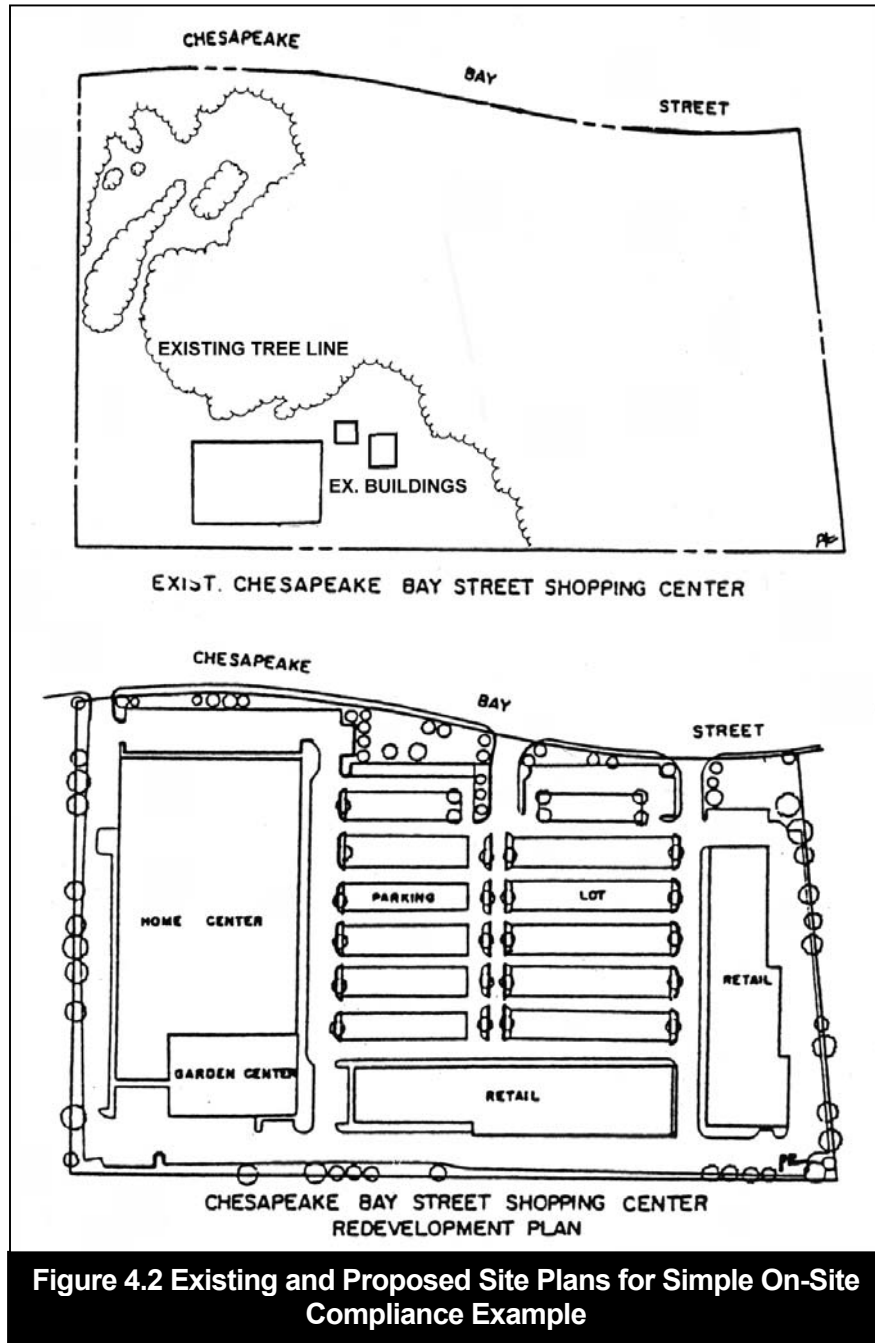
Existing and Proposed Site Plans for Simple On-Site Compliance Example
